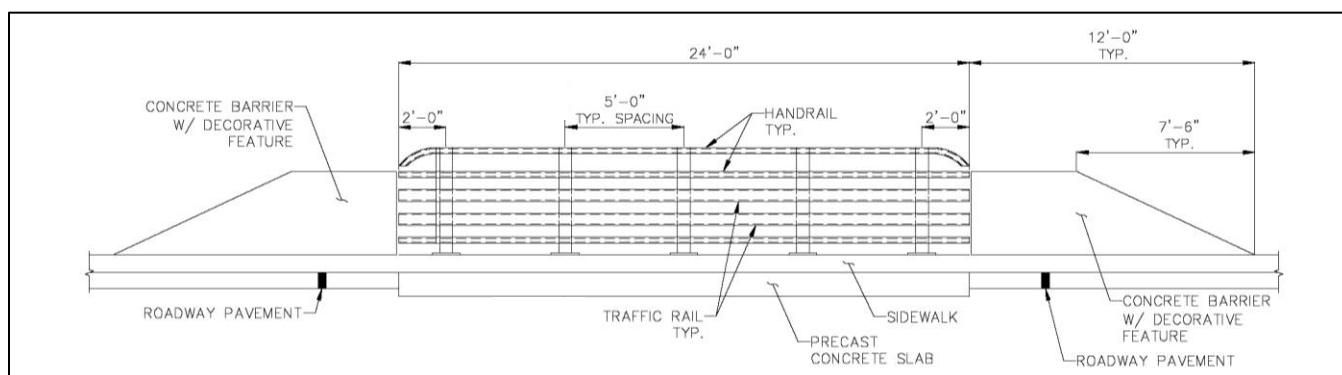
Open Rail Traffic Barrier with Pedestrian Rail
